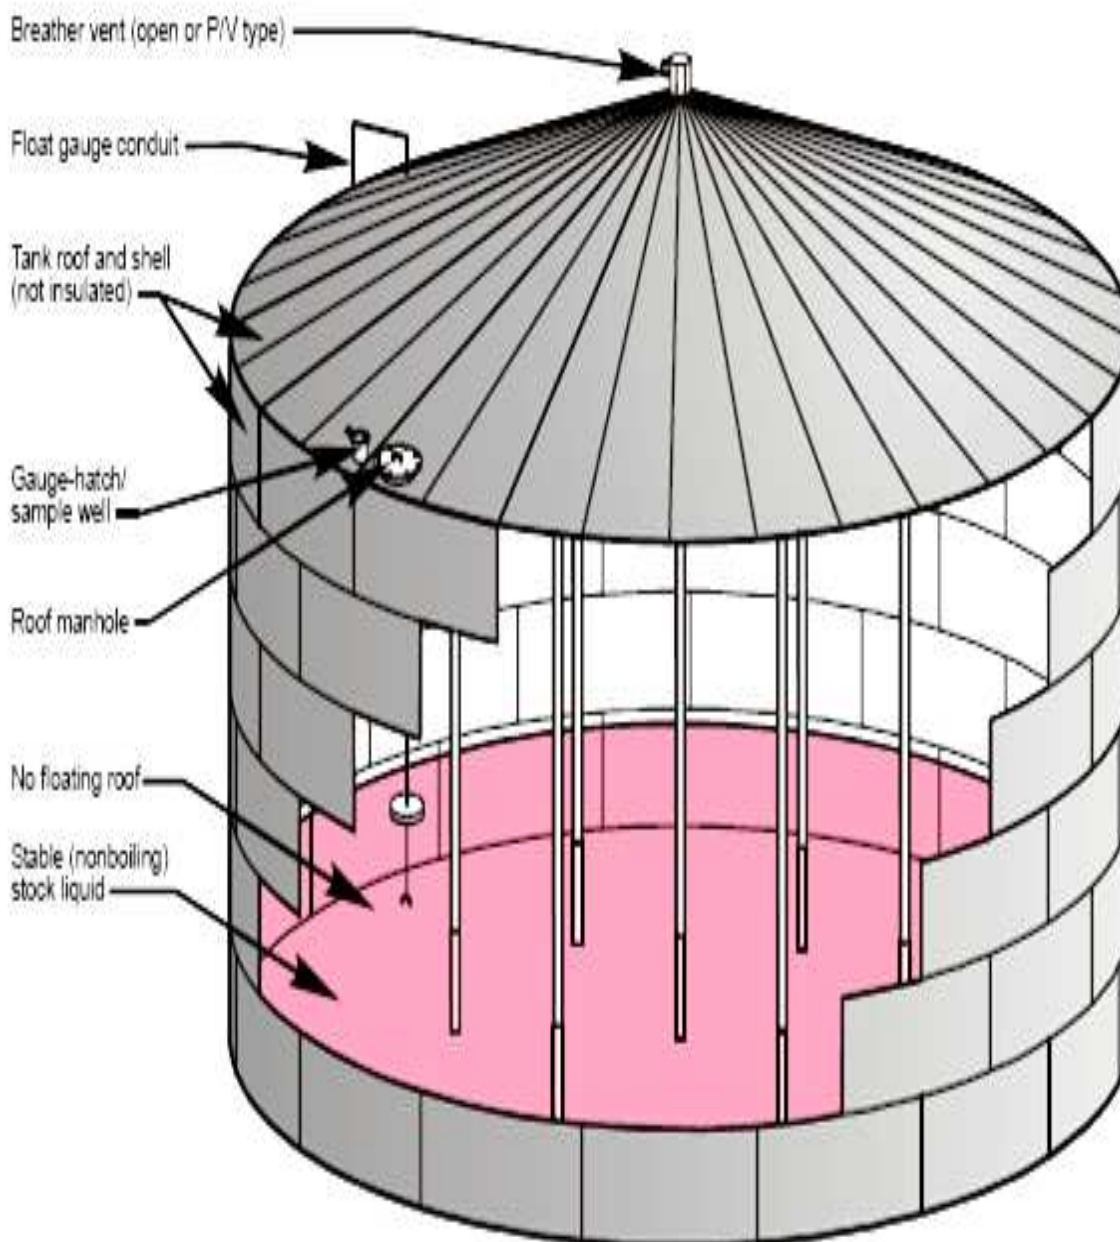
Fixed Roof Tank (From AP-42, Section 7.1, U.S. EPA)
